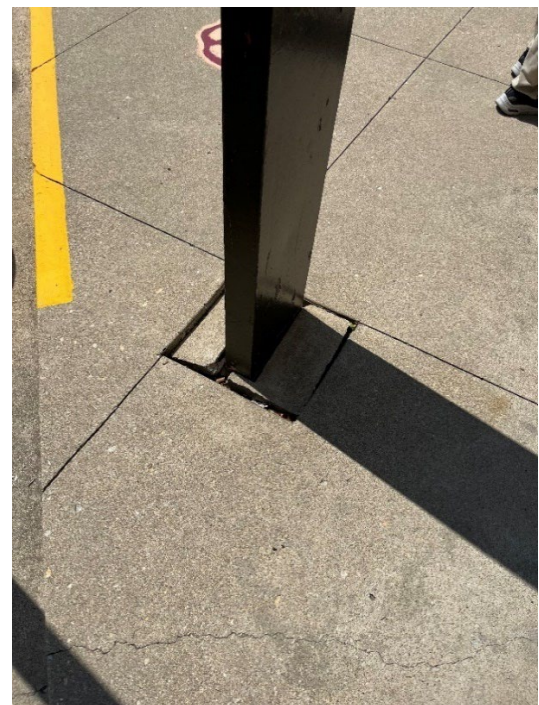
Cover Plate Cracked & Heaved at Entrance
